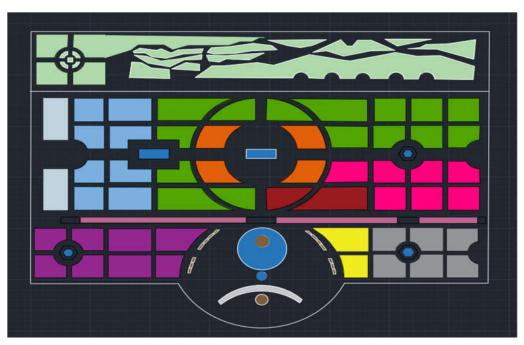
Structural and Plantal settlement layout in the study area (Original, 2021)
